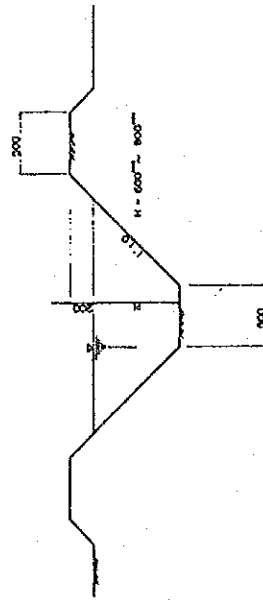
TYPICAL SECTION (CANAL AND ROAD)
